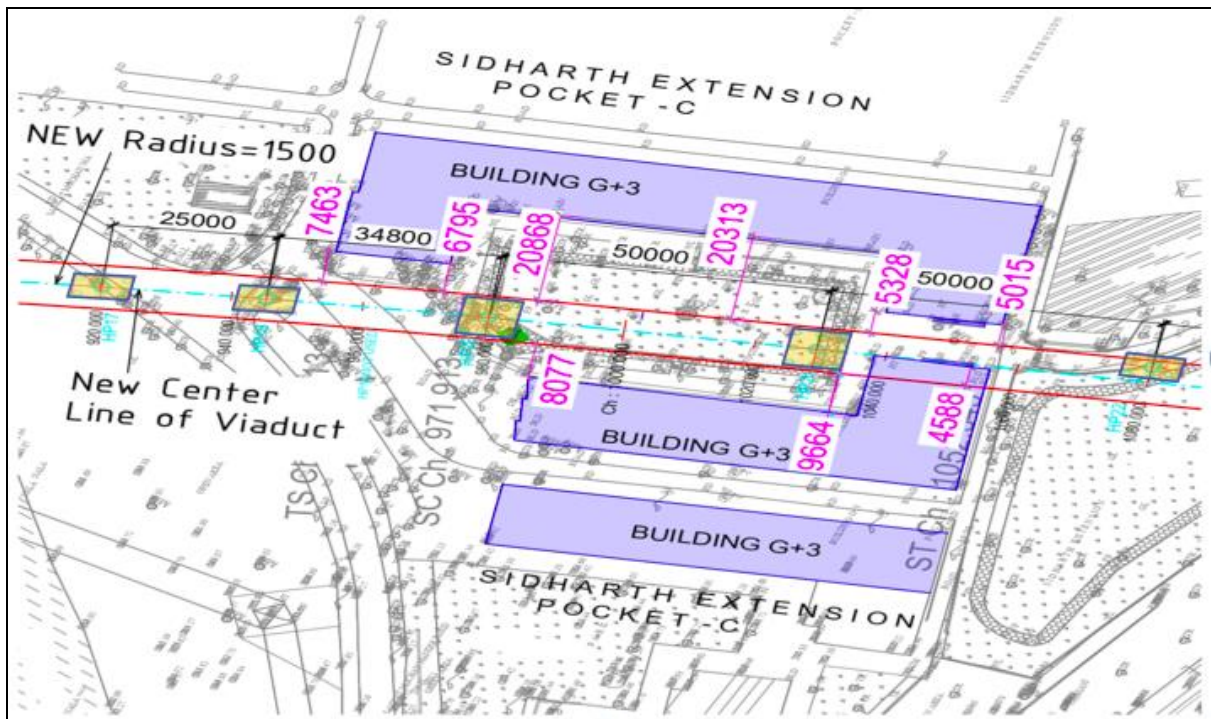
Plan Showing Alignment of Siddharth Extension-Old Alignment
